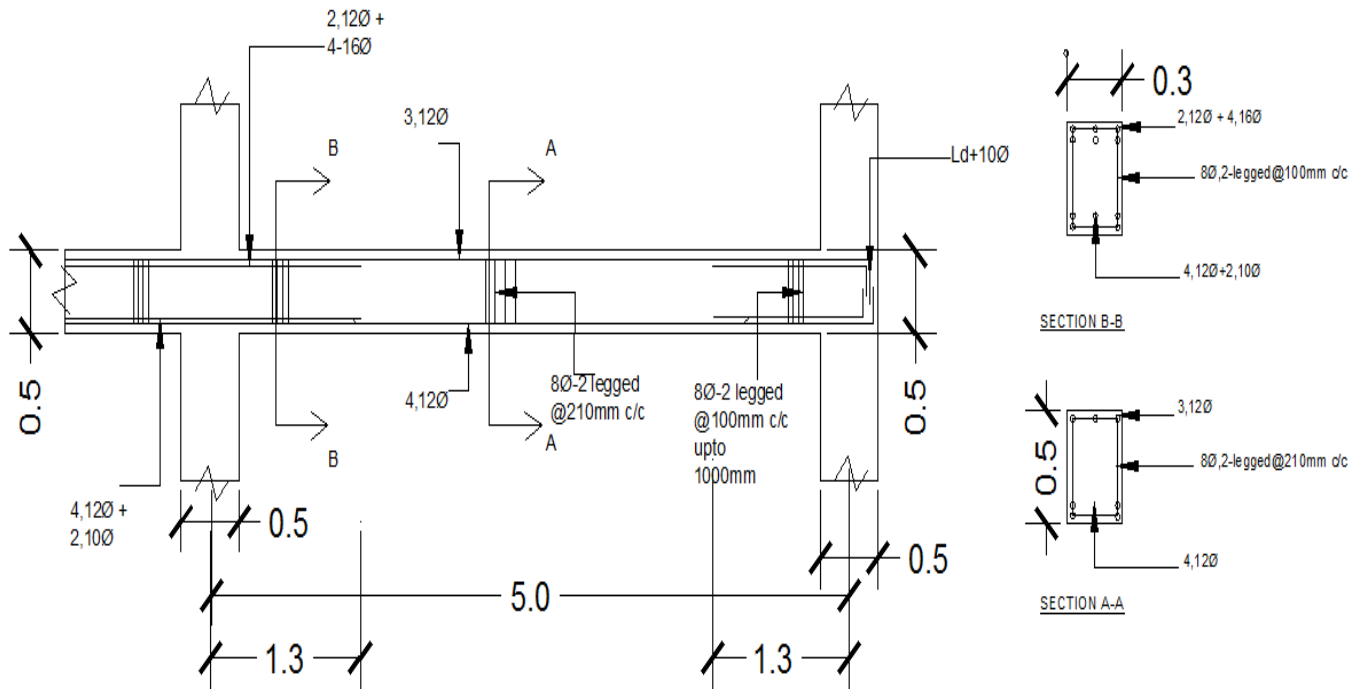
reinforcement detailing for an interior beam of G4ZV
